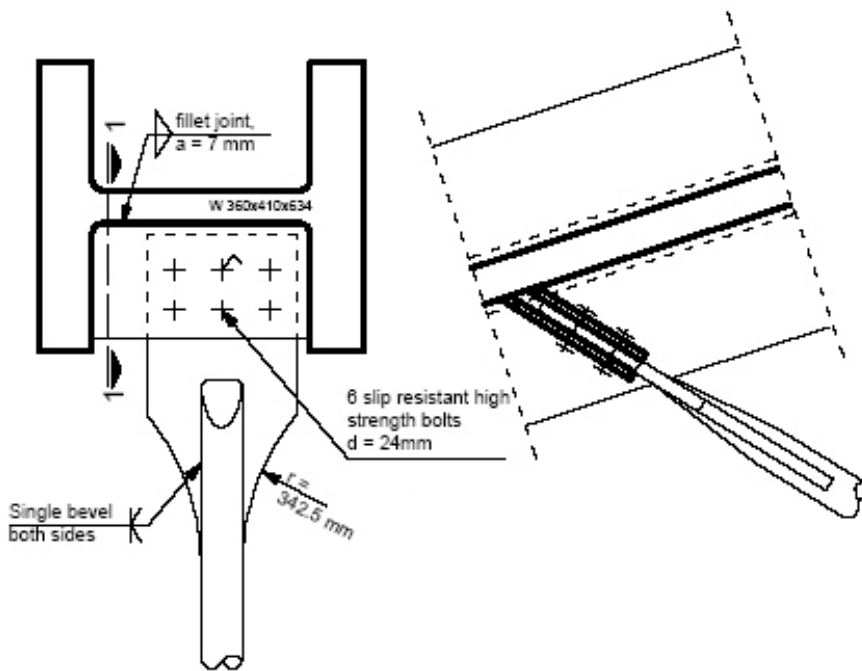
shows an example of a joint between arch and hangers. Brunn and Schanack examined many examples. [Teich 2004] has examined the design of ends of hangers in great detail.
